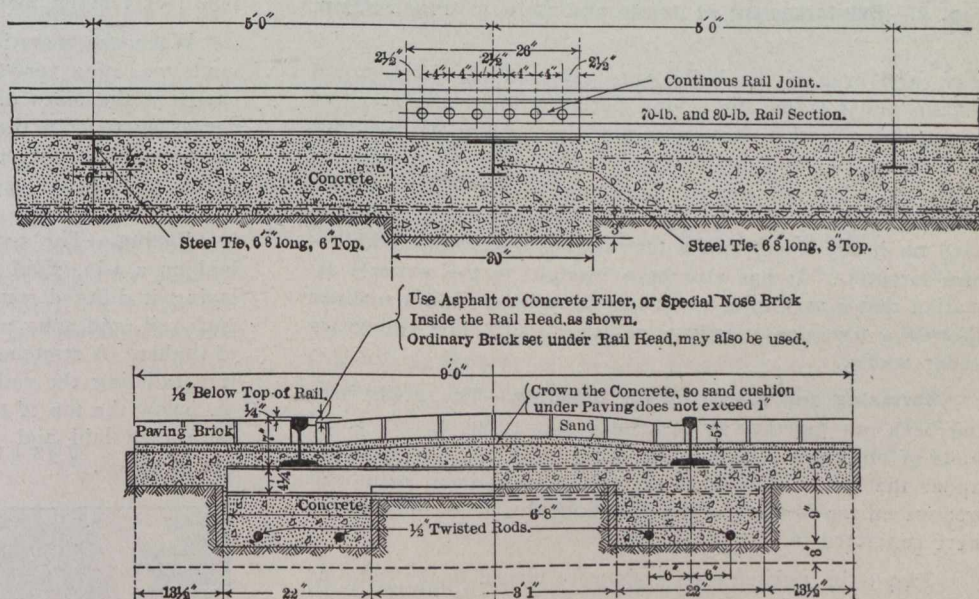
Section of Concrete Steel Tie Track Construction.
